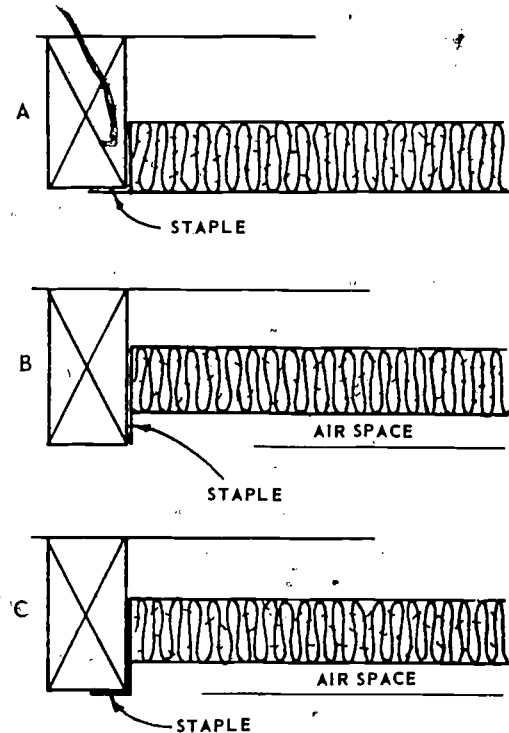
Methods of installing blankets and batts. A—Flush with inside surface of stud. B—Flange stapled along side of stud to form air space. C—Special flange.
